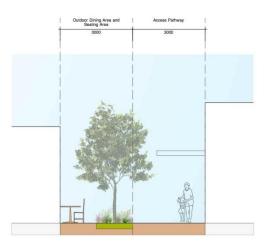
Lang Street Pedestrian Arcade Concept Plan
